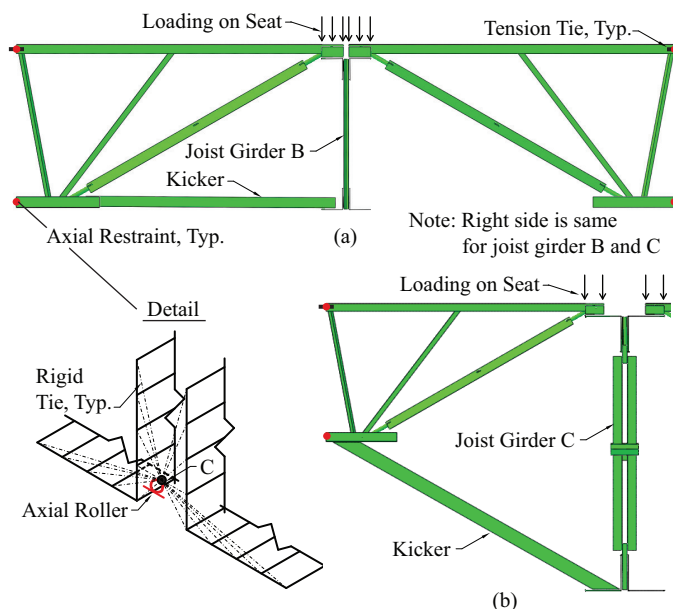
Joist girder loading and lateral bracing with axial restraint detail. (a) Joist girder B variation (b) Joist girder C variation
